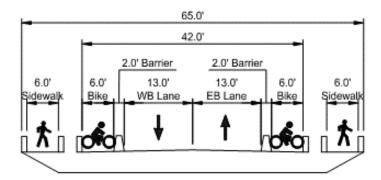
Temporary Bridge – Typical Section (At East and West Approaches)
